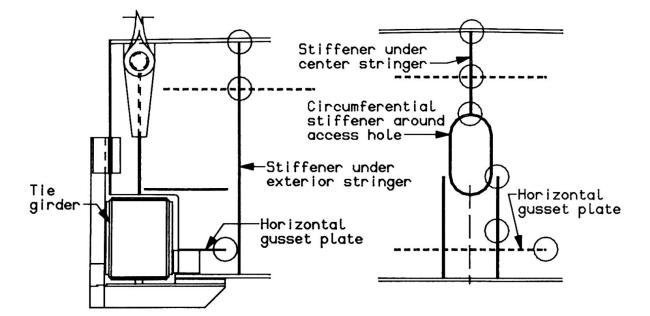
Locations of typical fatigue cracks on welded floorbeams.
